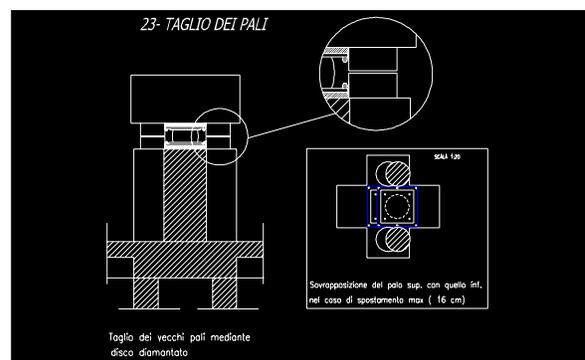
Sketch of the retrofit intervention on the Fabiano building.
